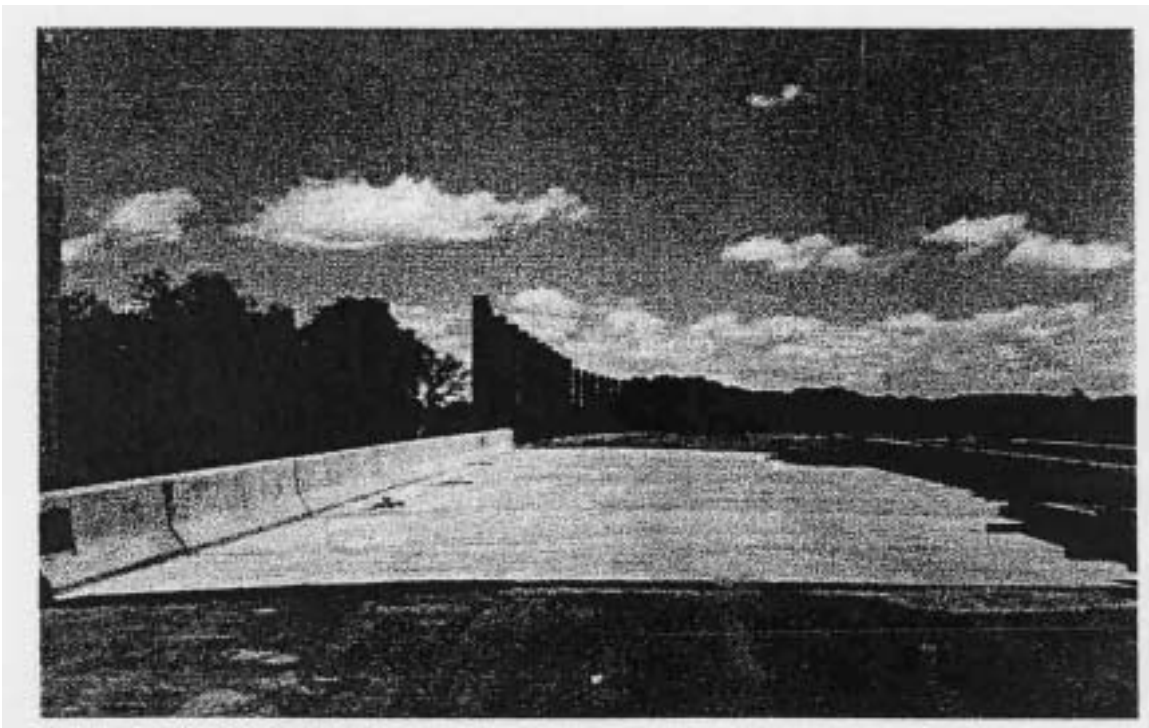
Bridge Deck over North Main Street Westbound near Completion
